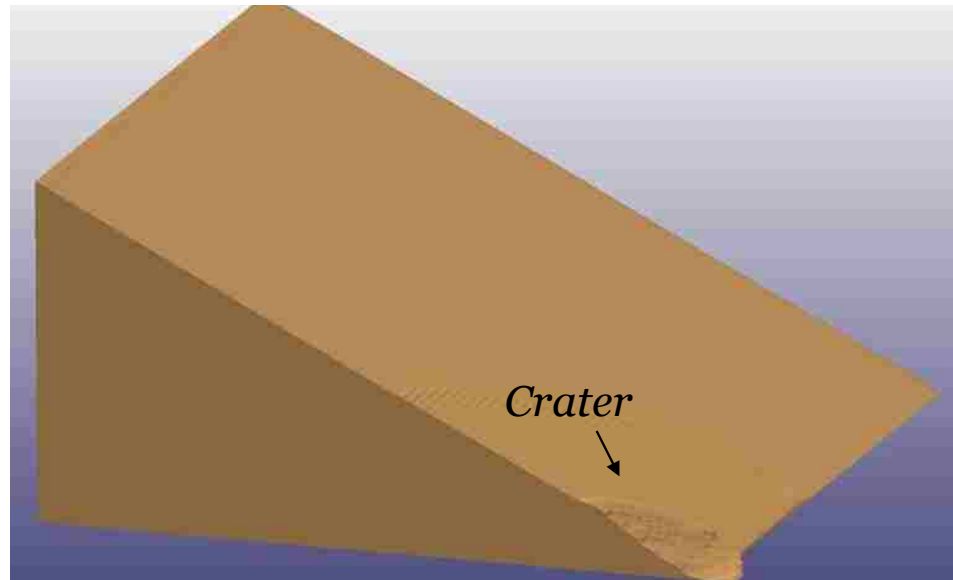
Post-blast crater formed on downstream slope of embankment dam
